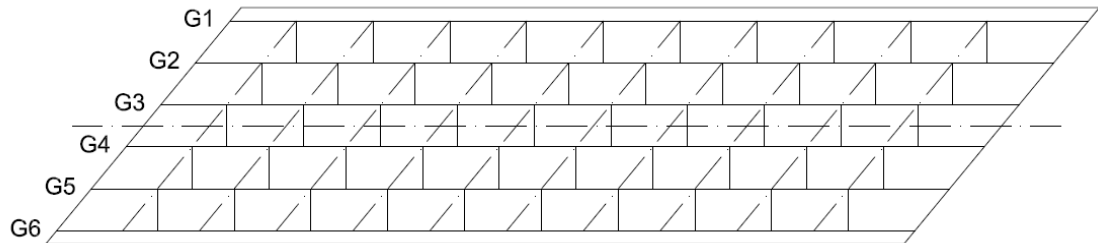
Staggered cross-frame arrangement of Bridge 18.
